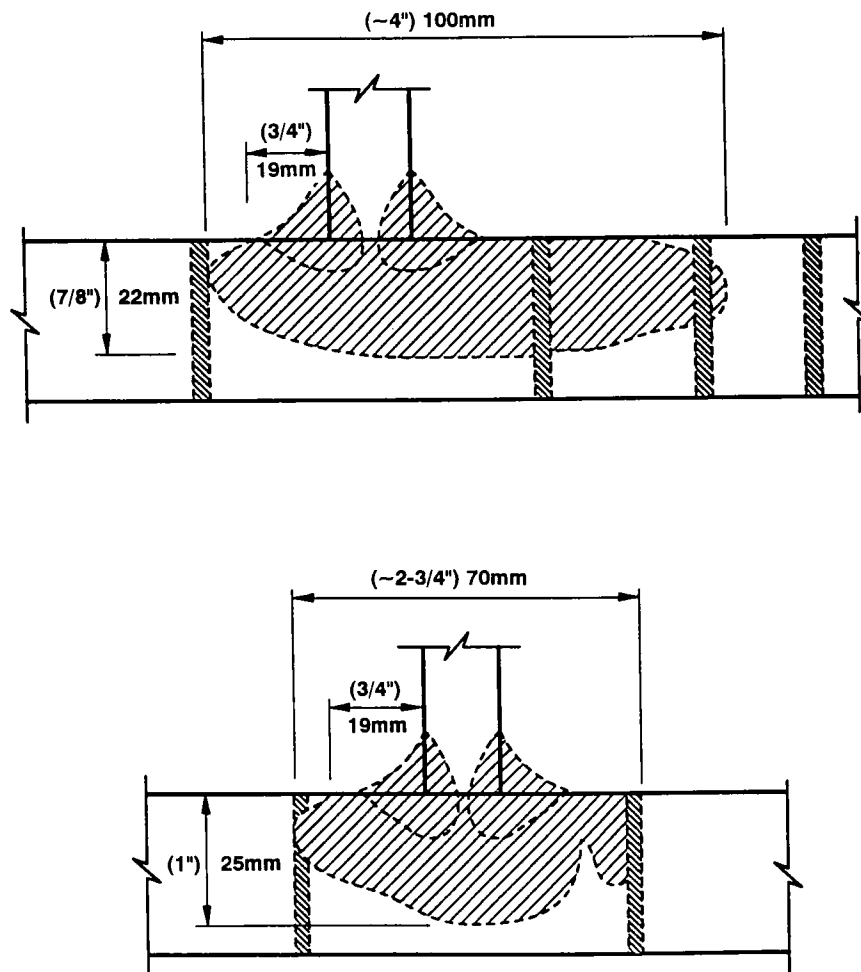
Projected crack geometry on plane perpendicular to girder flange: *top*, schematic of crack in flange at Core 17; *bottom*, schematic of crack in flange at Core 25.
